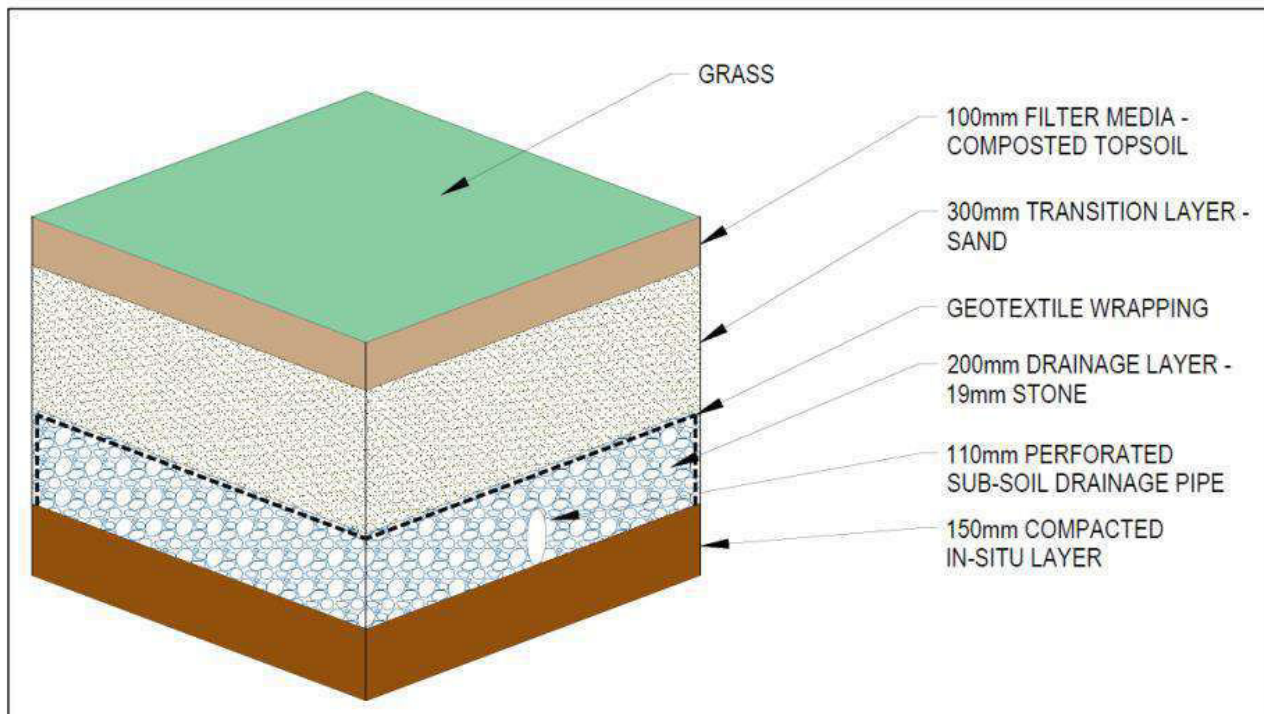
Typical Dry Attenuation Pond Engineered Layerworks (Zutari, Concept Stormwater Management Plan, August 2024).
